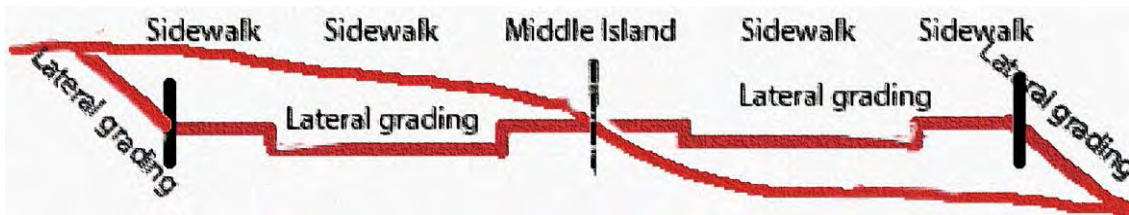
Cross section in non divided roads. Egyptian rule No. 159 of 1998. (The author)
